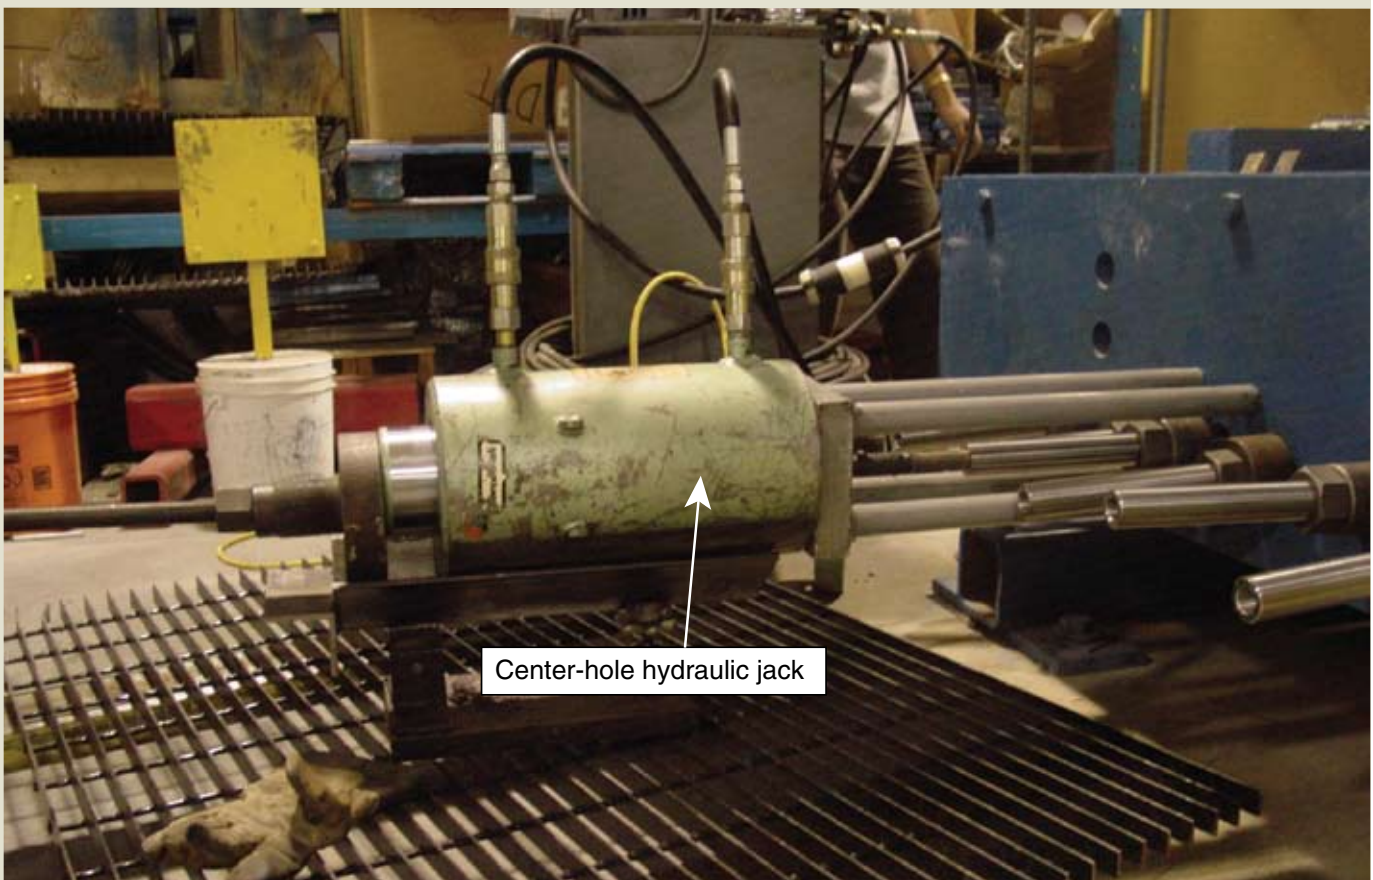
Shown are the anchorage details of CFCC strands used in the construction of the bridge models. Note: CFCC = carbon-fiber-composite cable. 1 in. = 25.4 mm.
